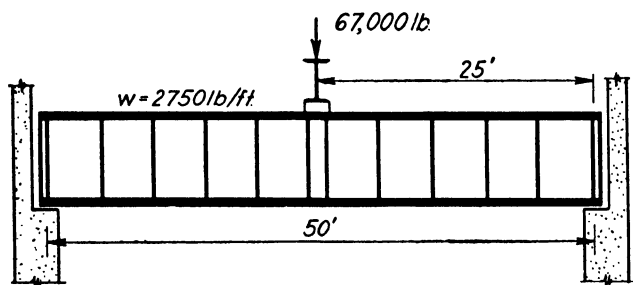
GIRDER DIMENSIONS AND LOADS.
